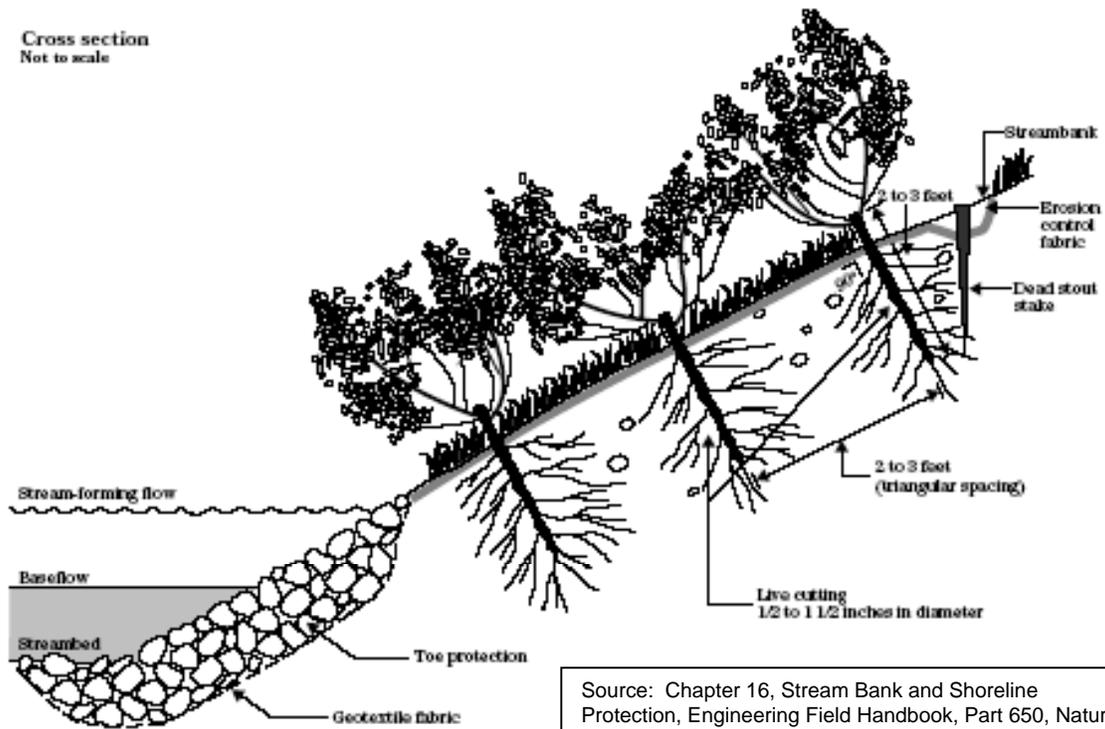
Live Stakes. This structural practice can be installed with or without structural stabilization.
